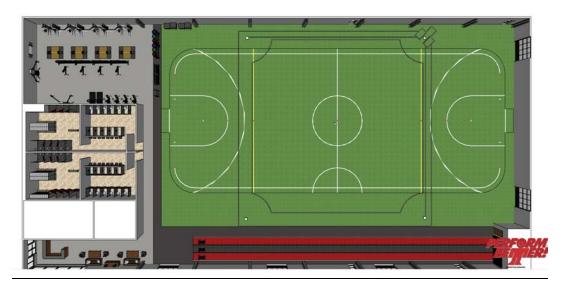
Summit Athletic Center - Conceptual Interior Design Layout
